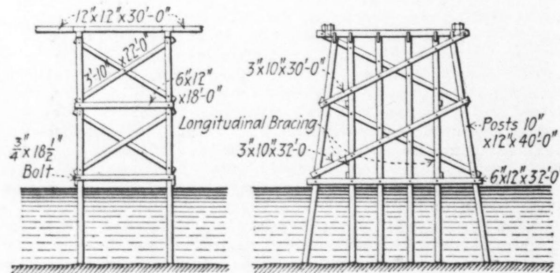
FALSEWORK TOWERS FOR THE 380-FT. DRAW SPAN
